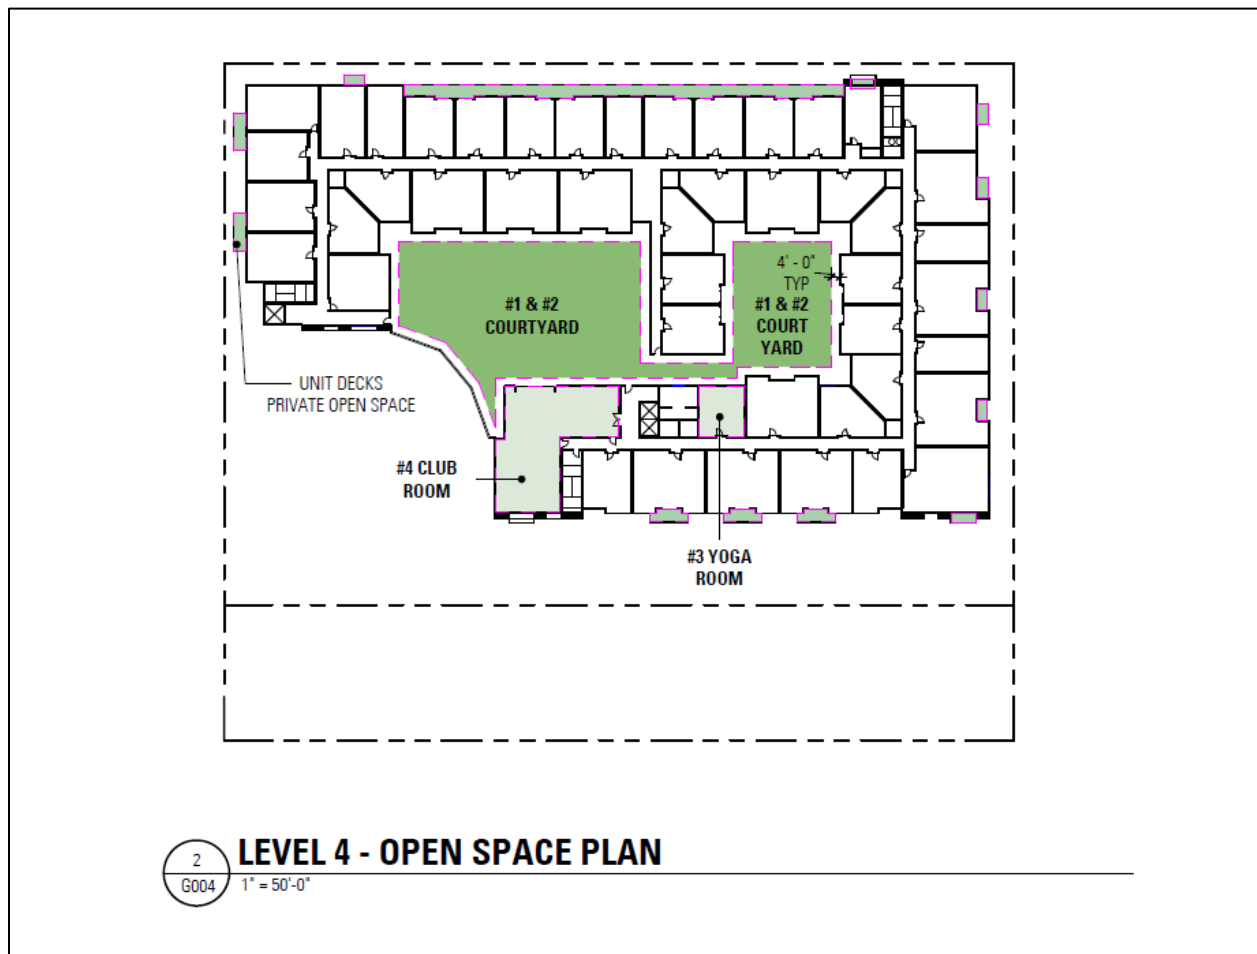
4590 Patrick Henry Drive site plan showing open space area on Level 4 where landscape vegetation will be located (shaded in green).
